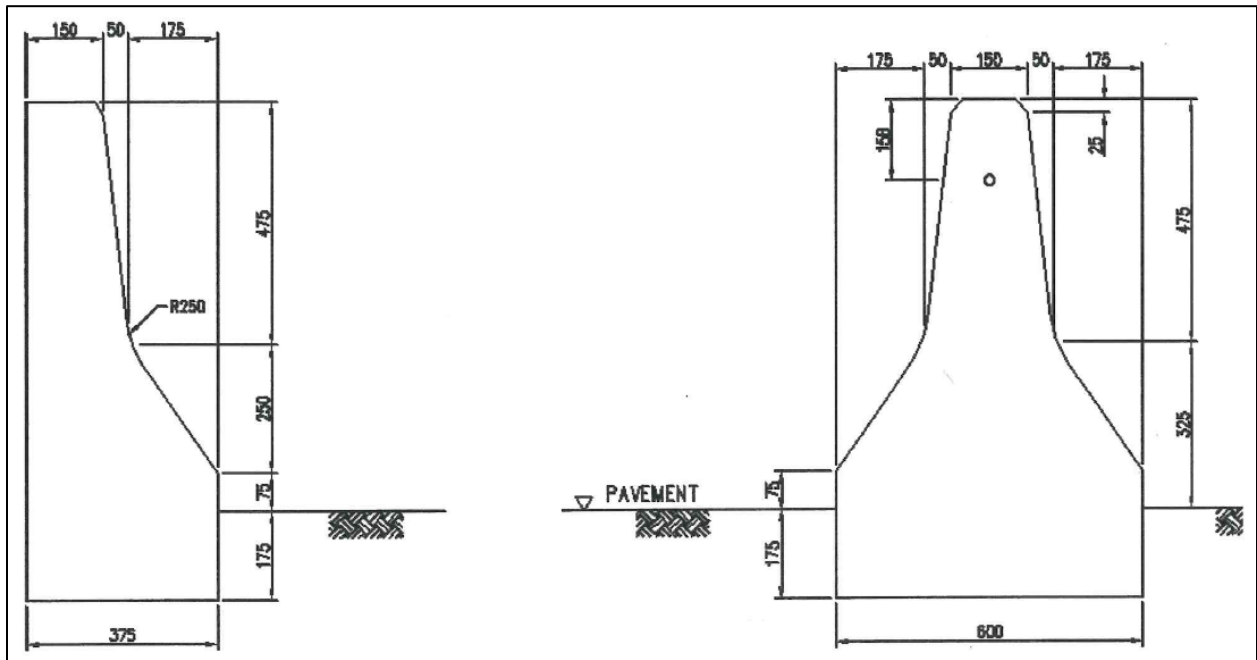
New Jersey-Shape Concrete Barrier (NJB)
